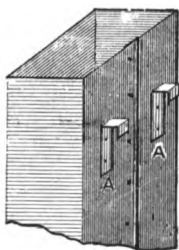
Method of Soldering or Riveting the Angles on Leaders.
